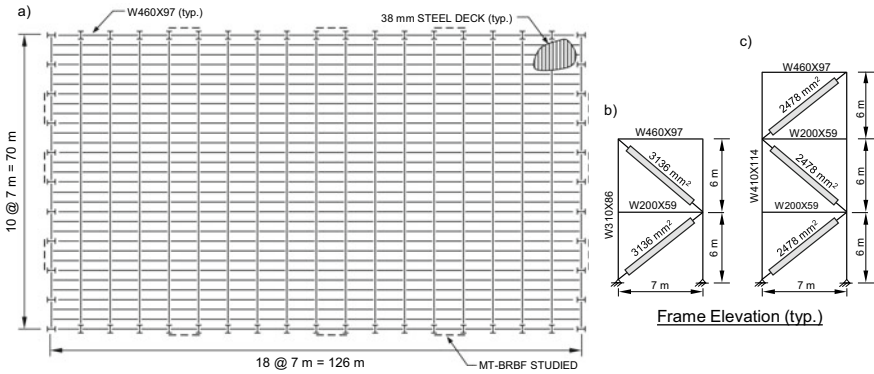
a Plan view of the selected building; b Two-tiered BRBF elevation; c Three-tiered BRBF elevation
